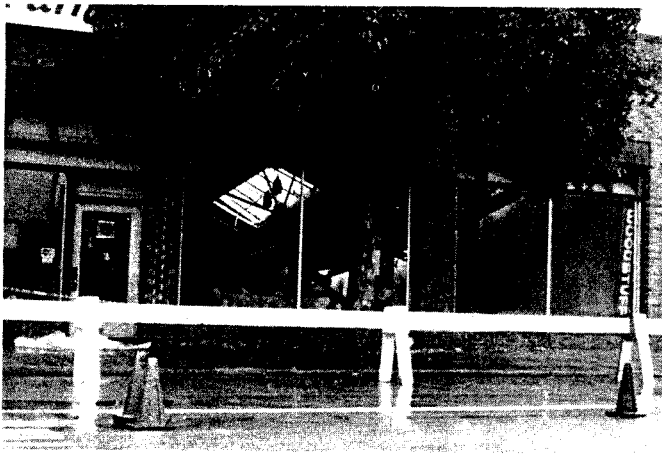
Typical failure due to slip of roof joists off their wall supports (Santa Cruz).
